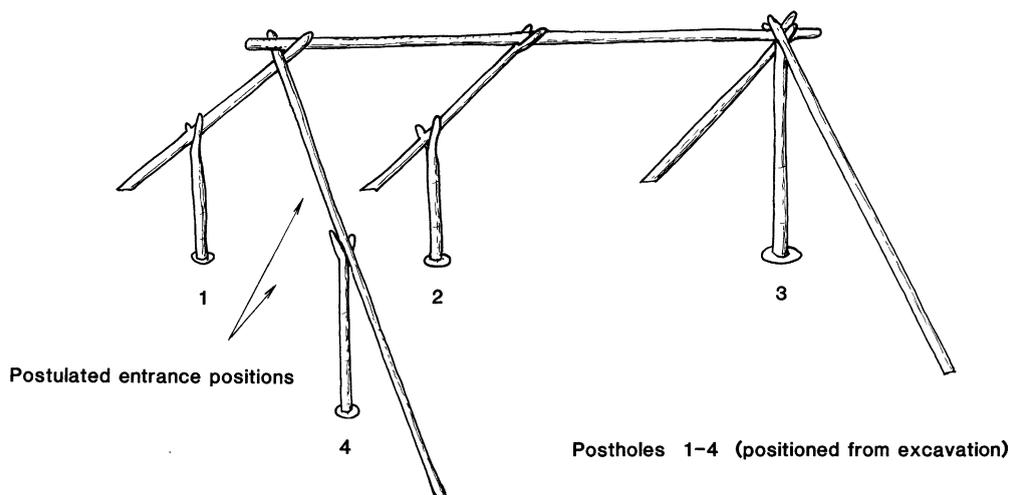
Sketch of timber-frame related to the posthole plan used for the reconstruction.
